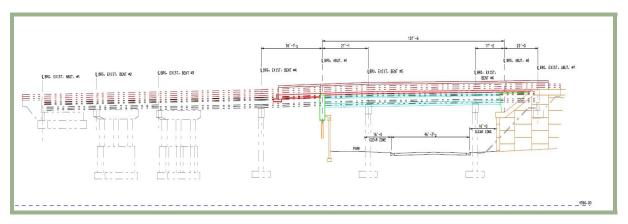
Typical of the New Bridge Structure at Highland Drive
